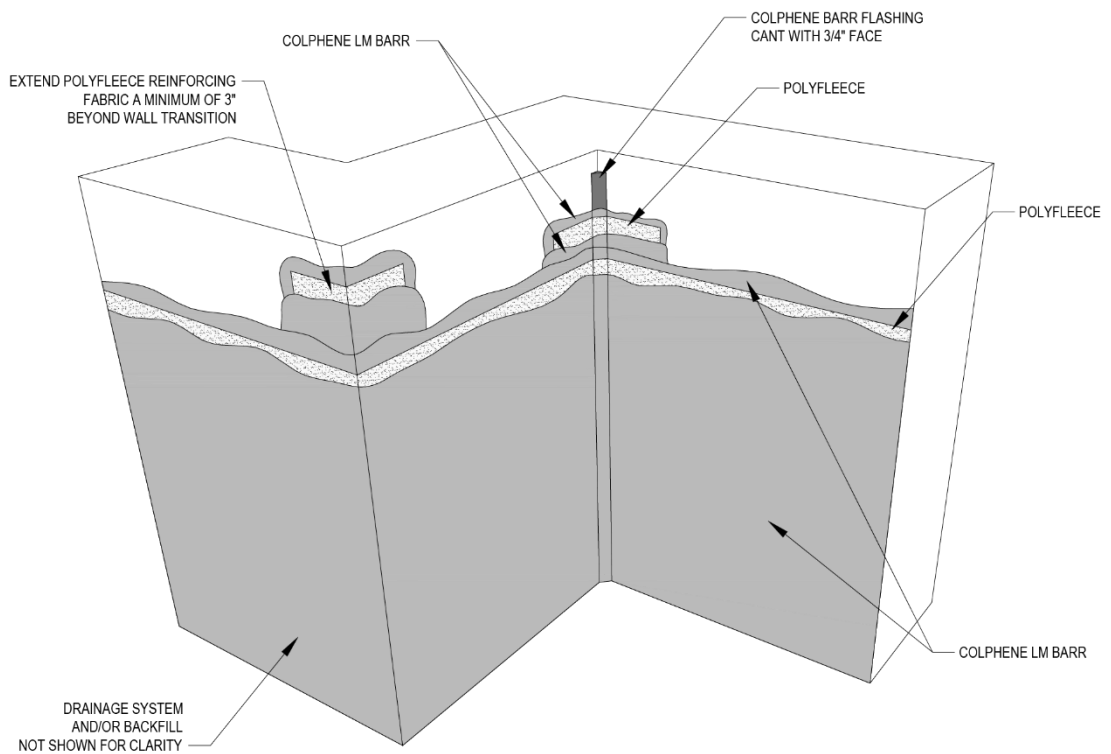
Reinforced COLPHENE® LM BARR At Inside/Outside Corners
